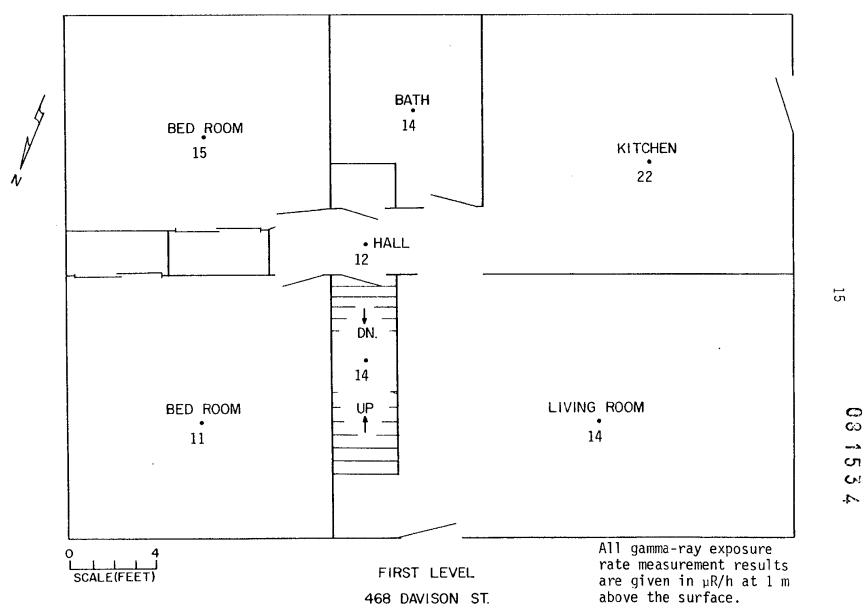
Schematic of the first level floor plan at 468 Davison Avenue
